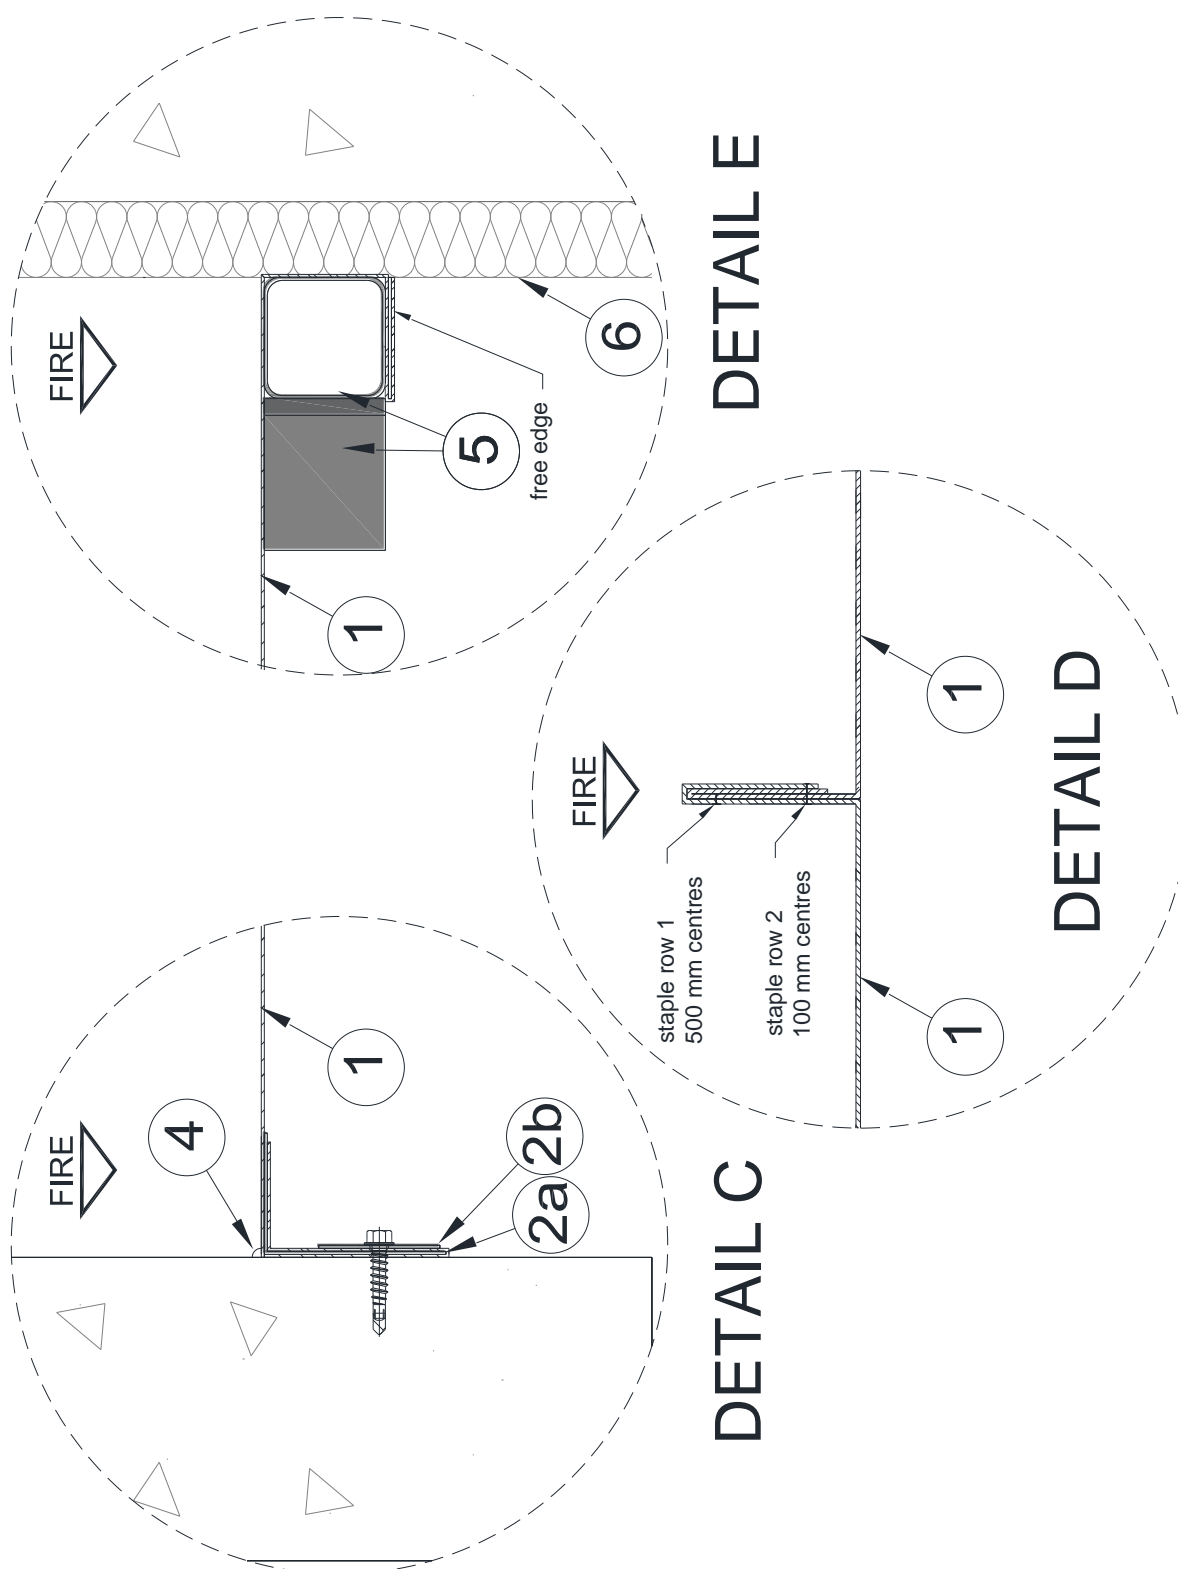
Detailed horizontal section through test specimen (Details C, D & E)
